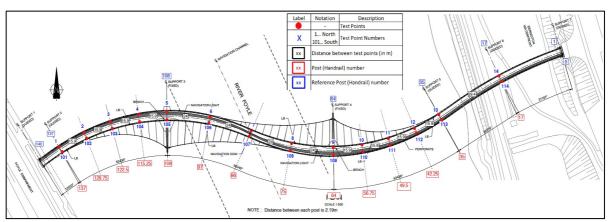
Peace Bridge, plan dimensions and test points for vibration testing (TP's)
